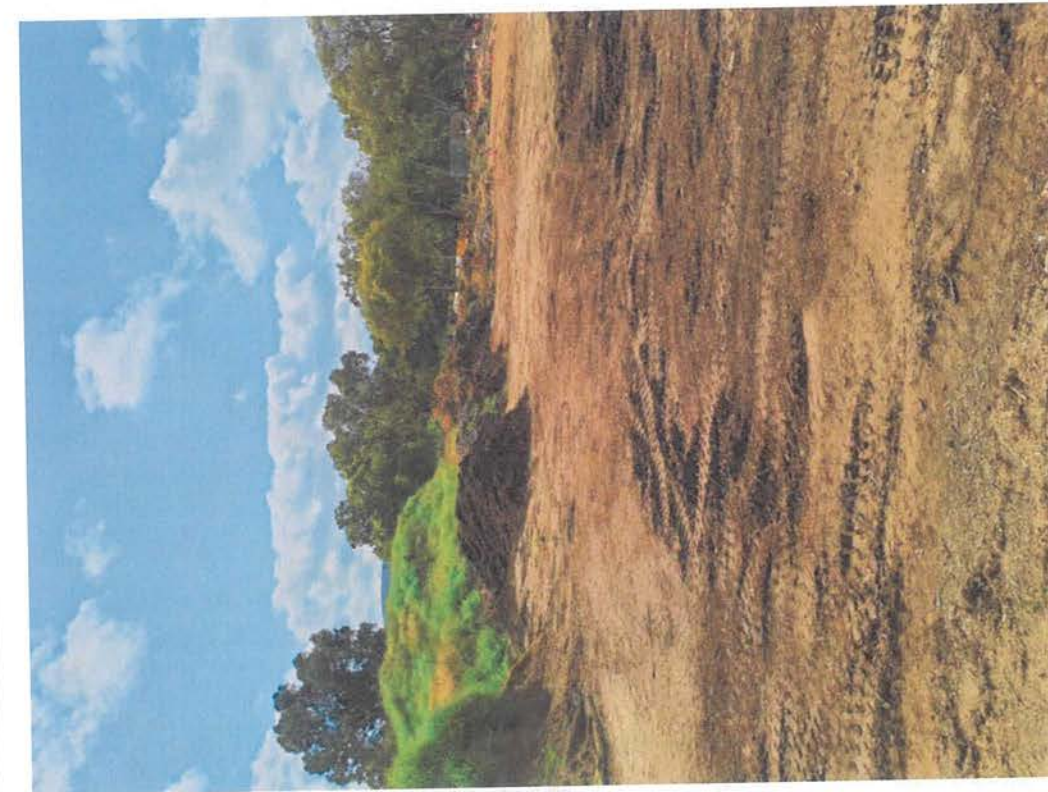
South-west corner of 'Green Waste Stockpile' area, facing north
